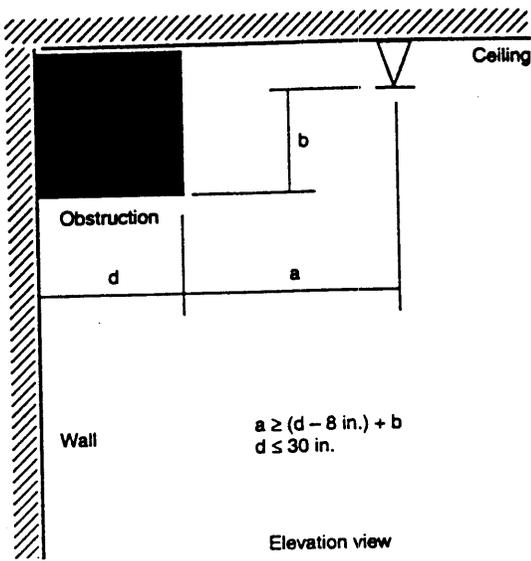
(b) Obstructions against walls (SSU/SSP).
